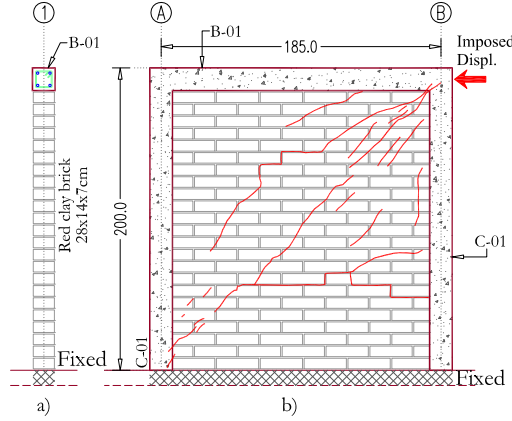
Geometry, loading and boundary conditions for cantilever wall with masonry in-fill [91]
